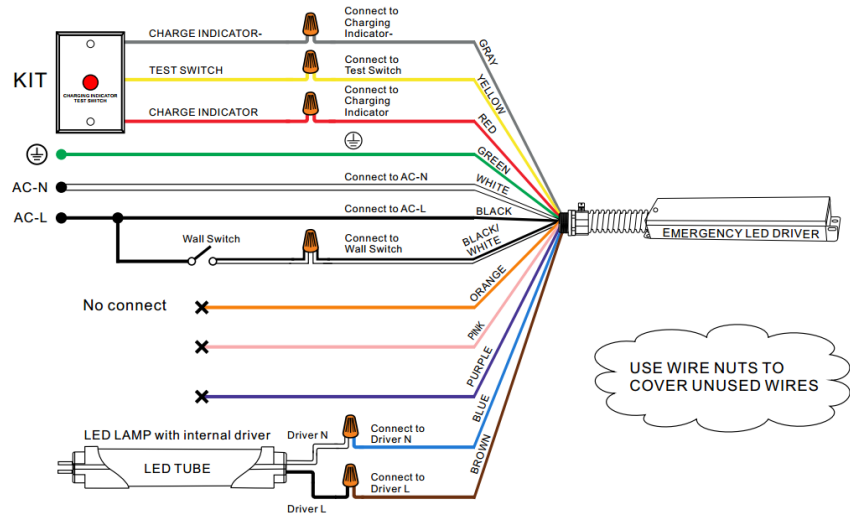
Figure E. The fixture does not support 0-10V dimming and the fixture is equal to or lower than that of the emergency LED driver.
